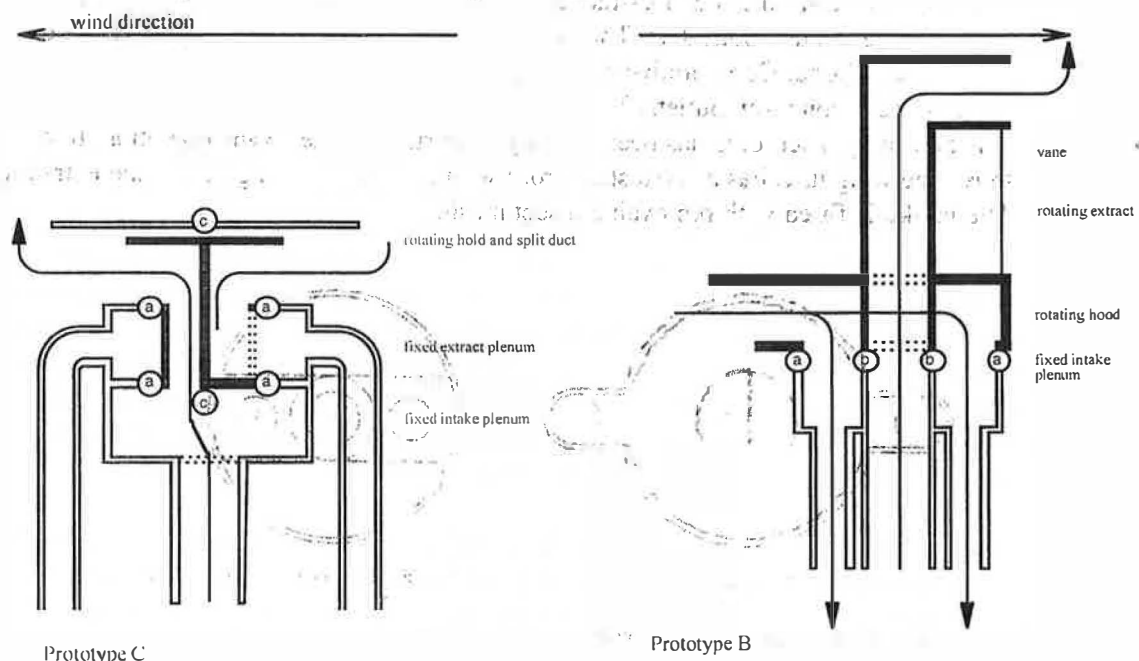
Comparative sections prototypes B and C. Rotating elements are shown in black line. a - ring seal, b - sealed turret bearing, C - shaft bearing.
